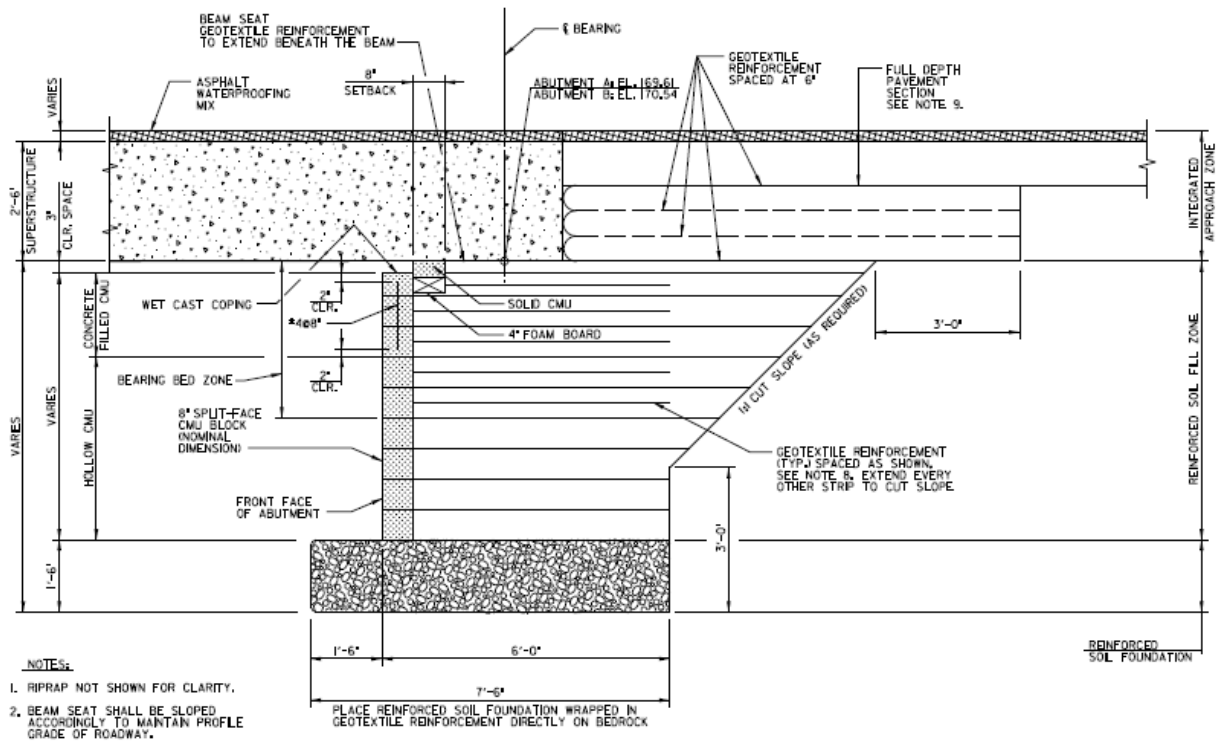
Diagram. GRS abutment section view of 27th Street, NW bridge.
